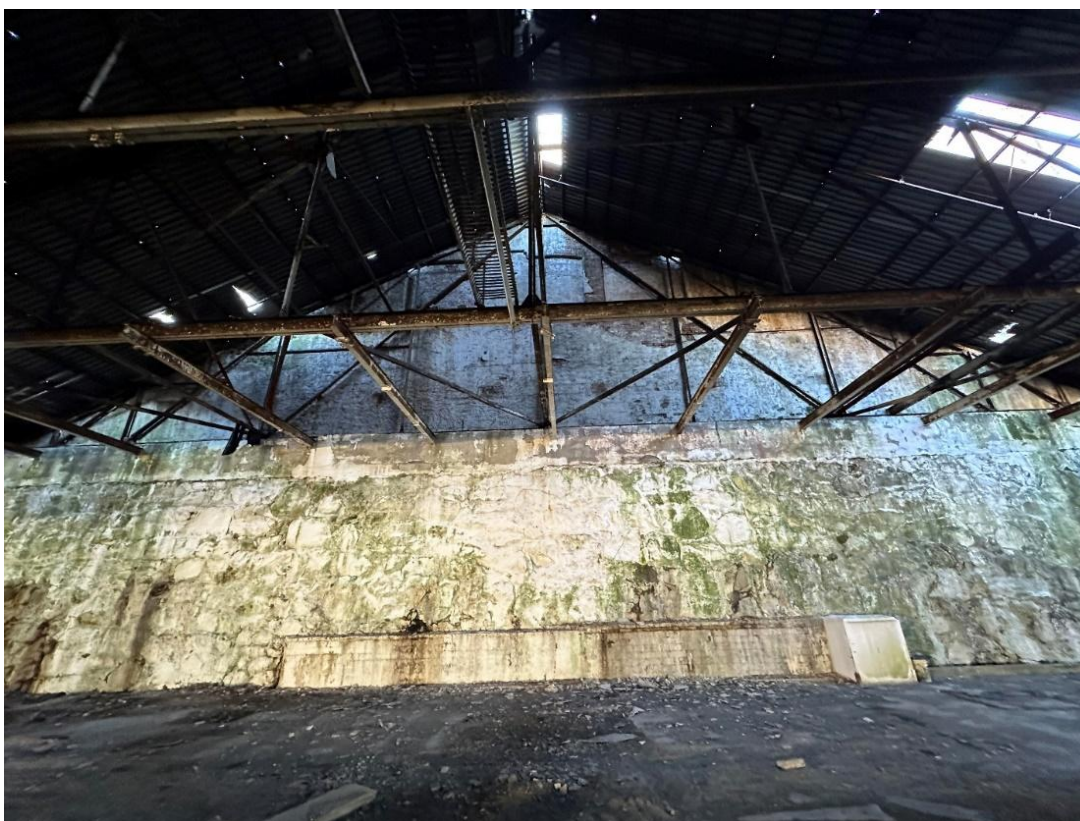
Interior of the Rolling Mill (building 34/223) showing detail of the east elevation. Photo facing west.
